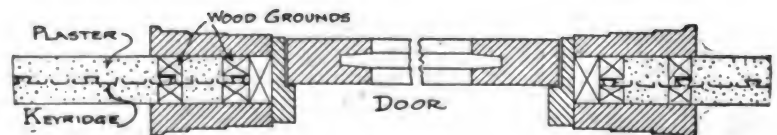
PARTITION—HORIZONTAL SECTION AT DOOR
